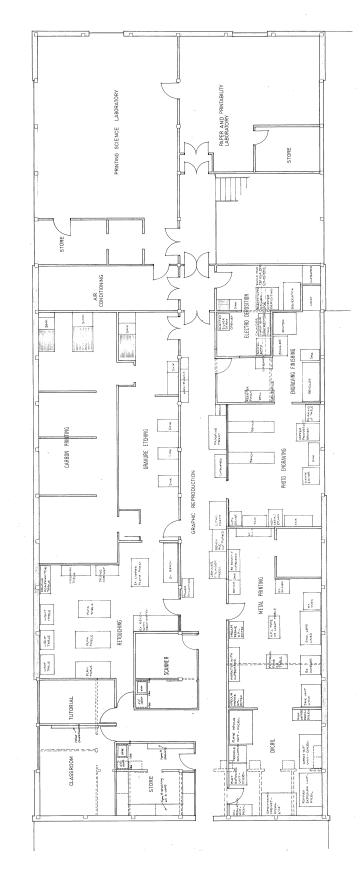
First Floor plan of North Range proposed in 1971 (not to scale)
